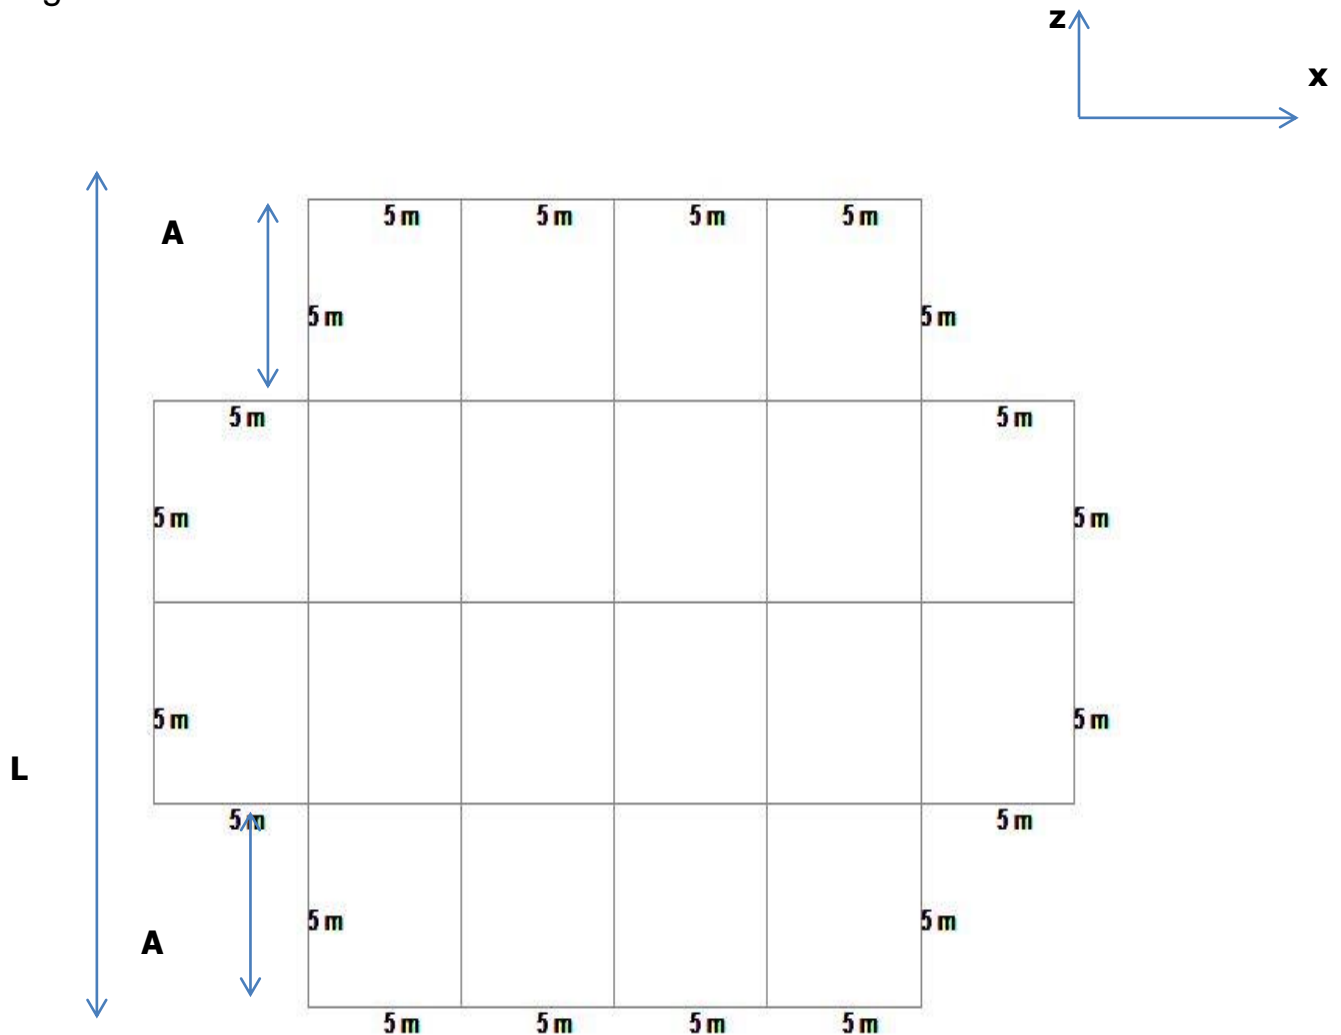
Plan of + shaped Re-entrant corner Structure(12 Storeys)
